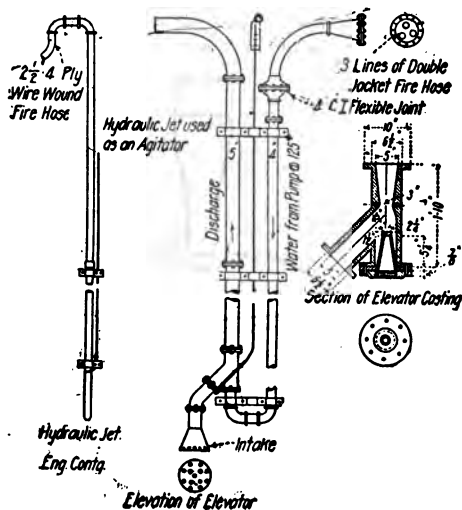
Hydraulic Elevator and Jet Used for Excavating and Discharging Material from Caissons of Vancouver Bridge.
